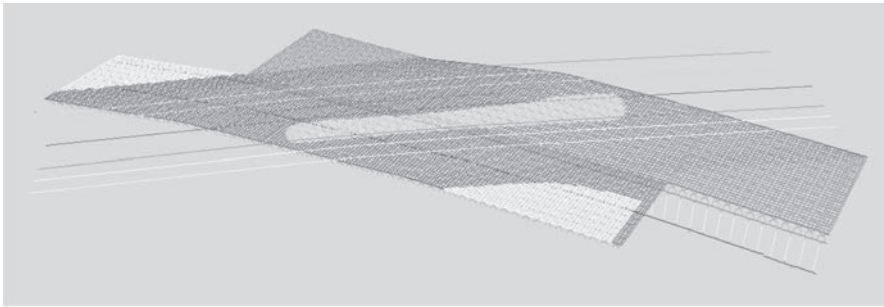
Queens Blvd Bridge SAP2000 finite element model.
